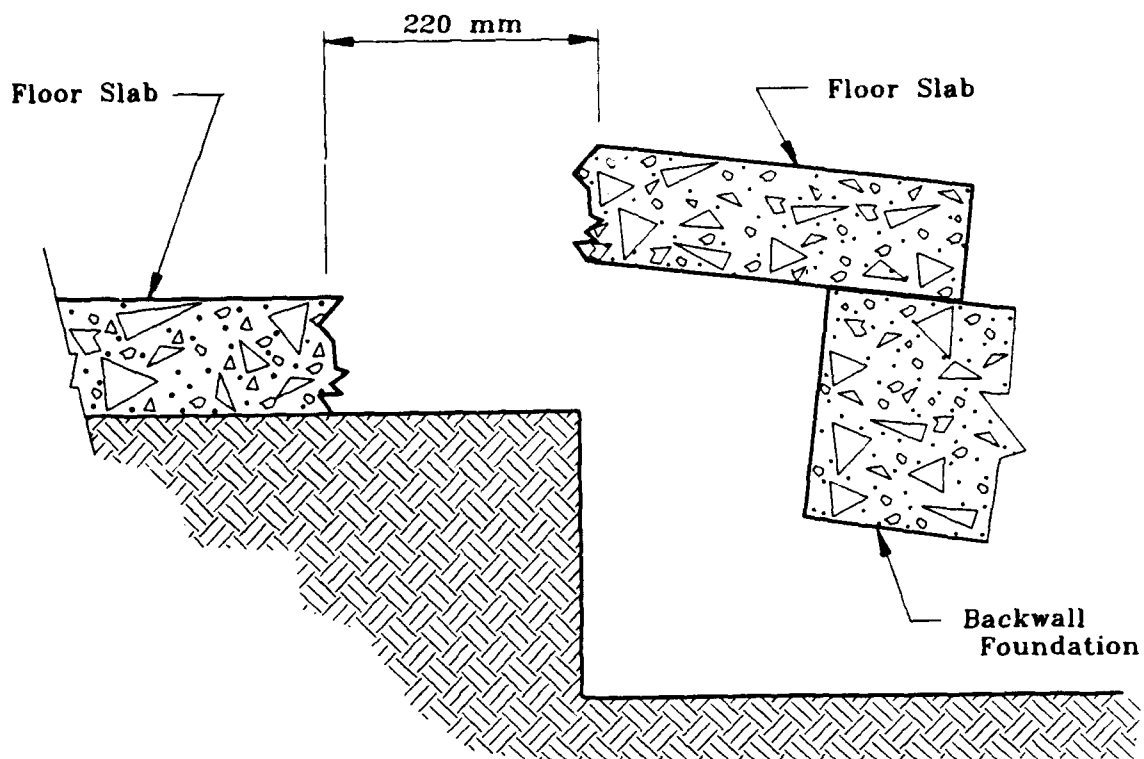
Crack pattern in floor slab at backwall foundation, PAS-4.
